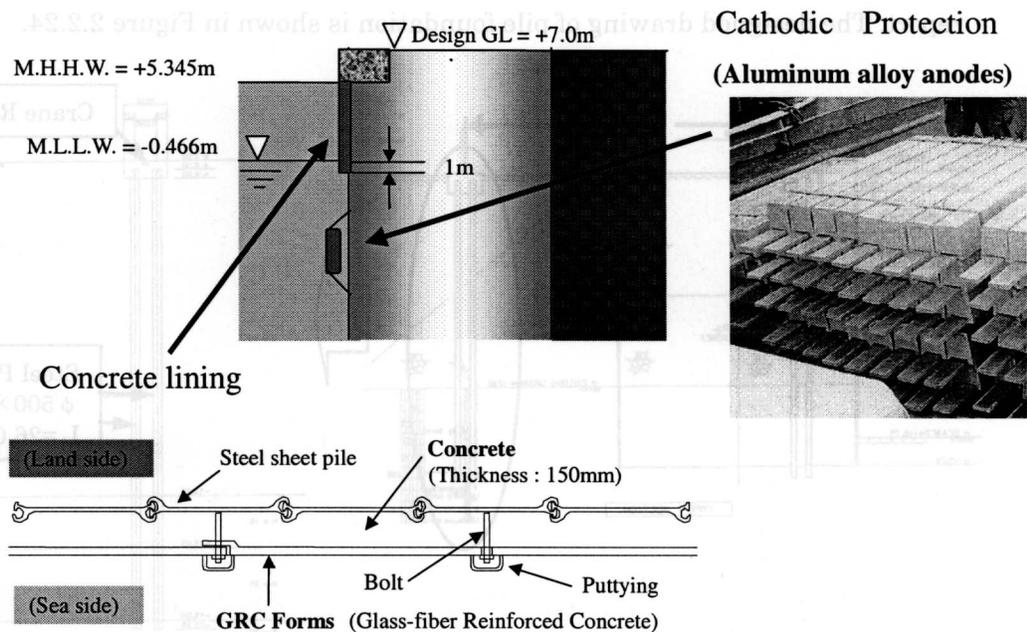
Anti-corrosion for Steel Sheet Pile
